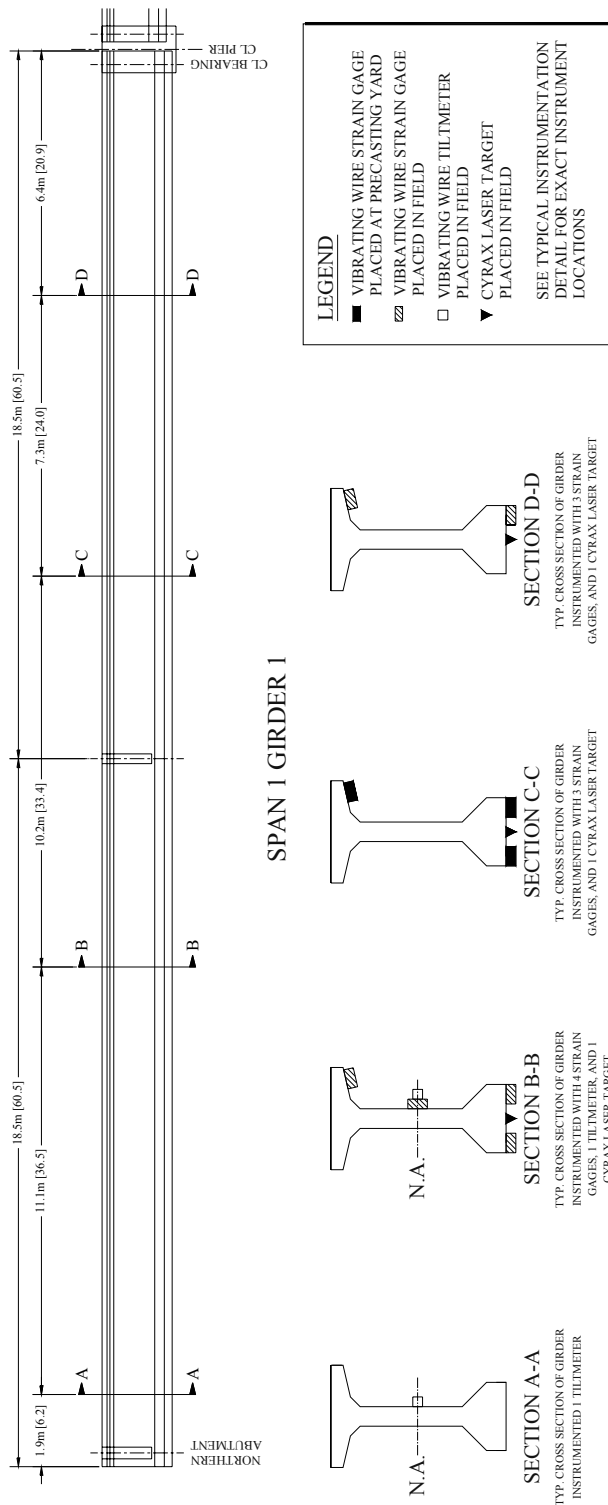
Representative Girder Instrument Locations (Bennett 2004).
